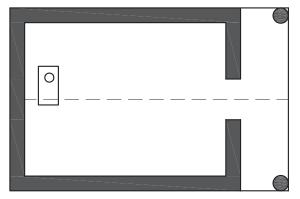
A typical plan for a Rocky Mountain-style log cabin. The door opens onto a covered porch on the gable end.
